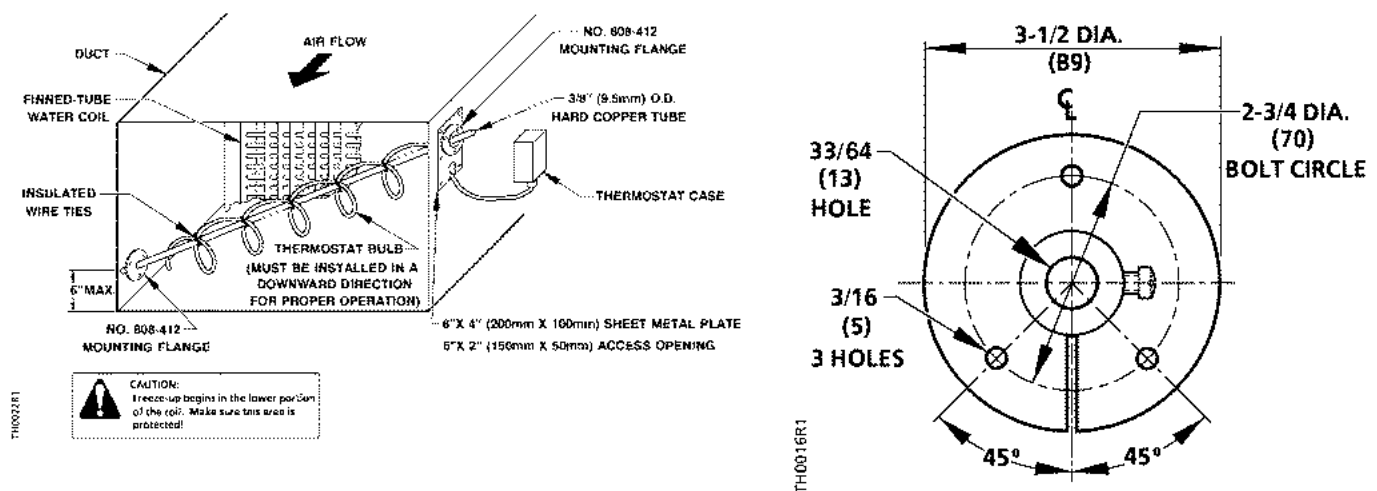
Bulb Mounting for Limited Access Ducts with Mounting Flange.
